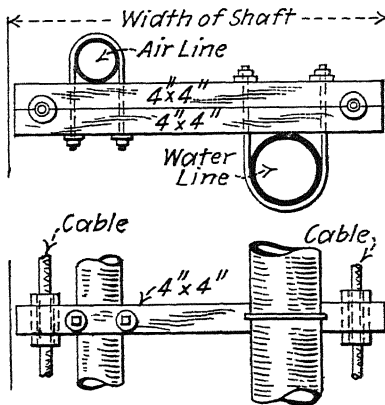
WOOD CLAMPS SUPPORTING PIPE COLUMNS ABOVE CARRIER.
